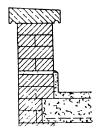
Reinforced concrete roof with waterproofed cement floating, skirting, and damp course through wall.
